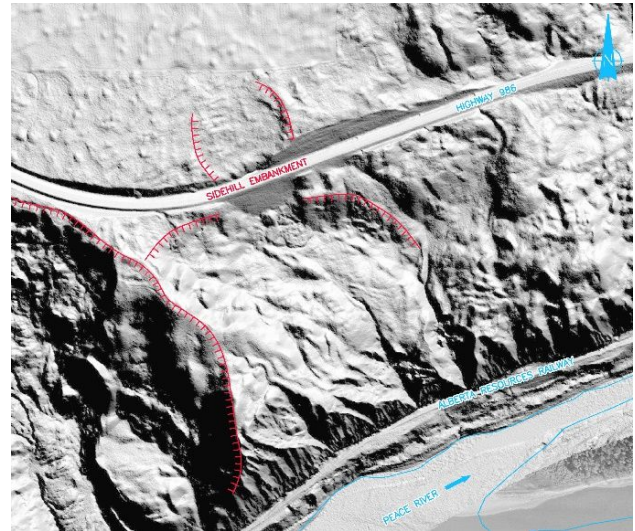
Bare earth LiDAR data prior to the sidehill embankment failure including location of ancient slope backscarps
